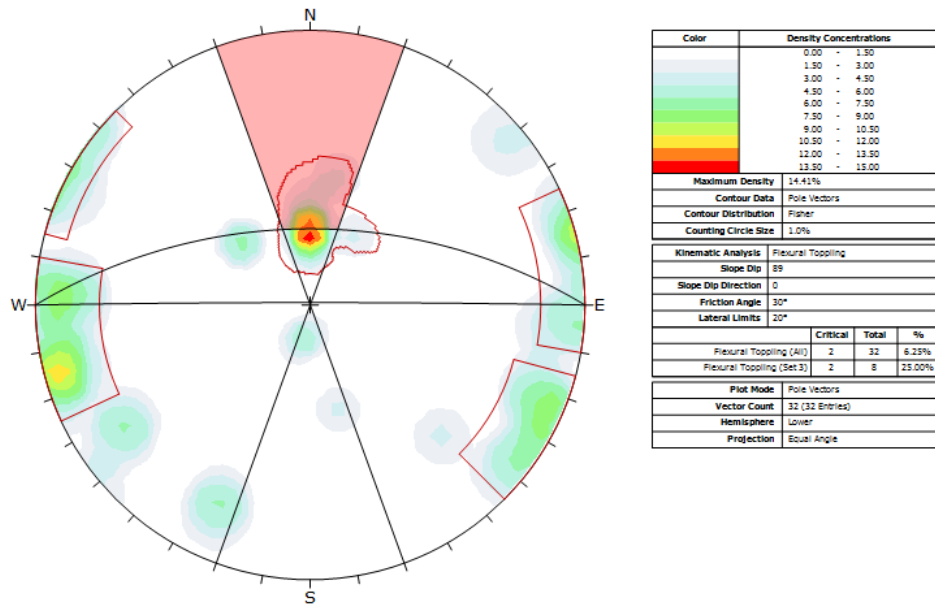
Toppling failure for PE03 Southern Wall at 89° bench slope angle (OD5).
